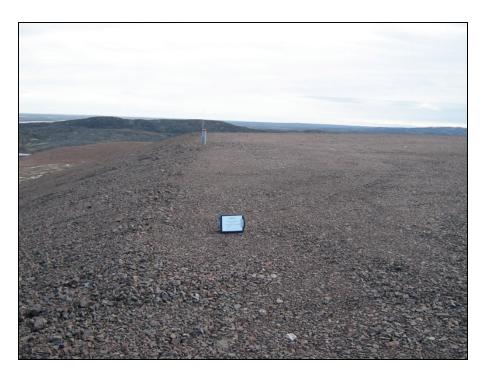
A. Northeast corner of landfill facing west. ____ ↑
